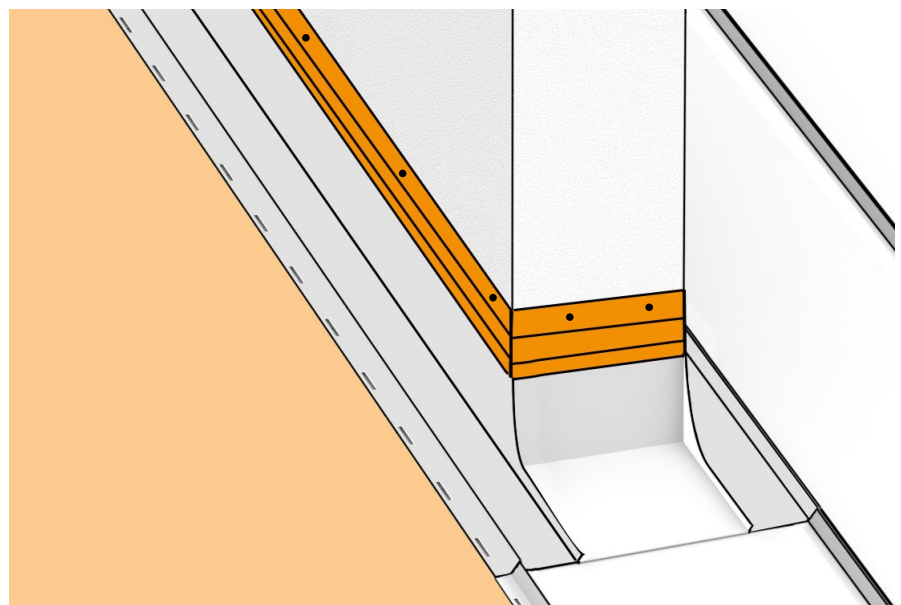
ASSEMBLY AND SEALING OF EXPANSION STRIPS
